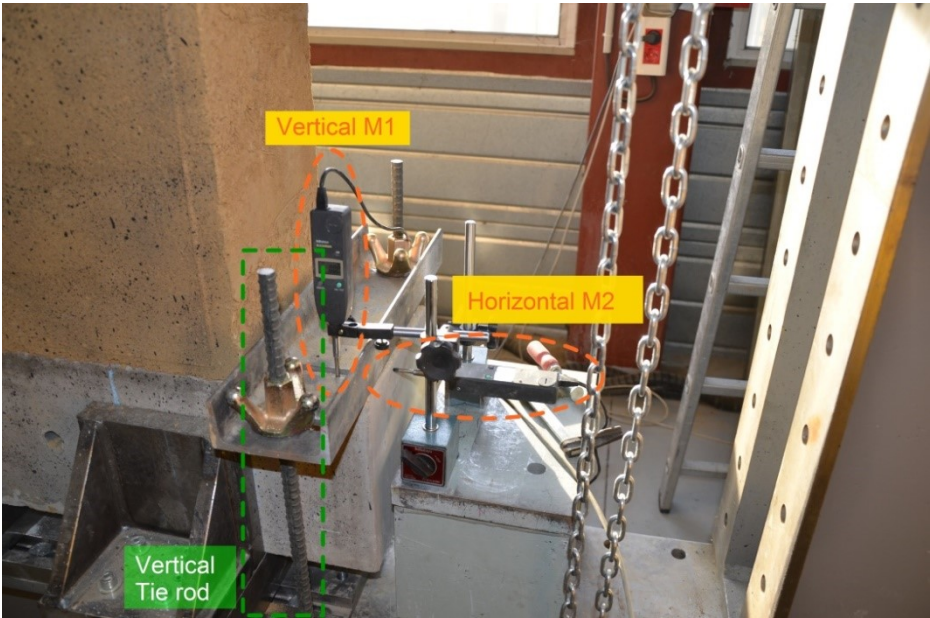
Vertical tie rod to prevent the beam from rocking
